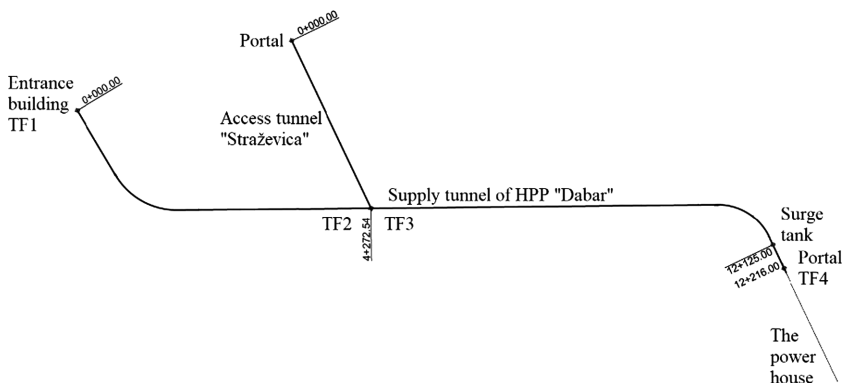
Site plan of supply tunnel of HPP “Dabar”
